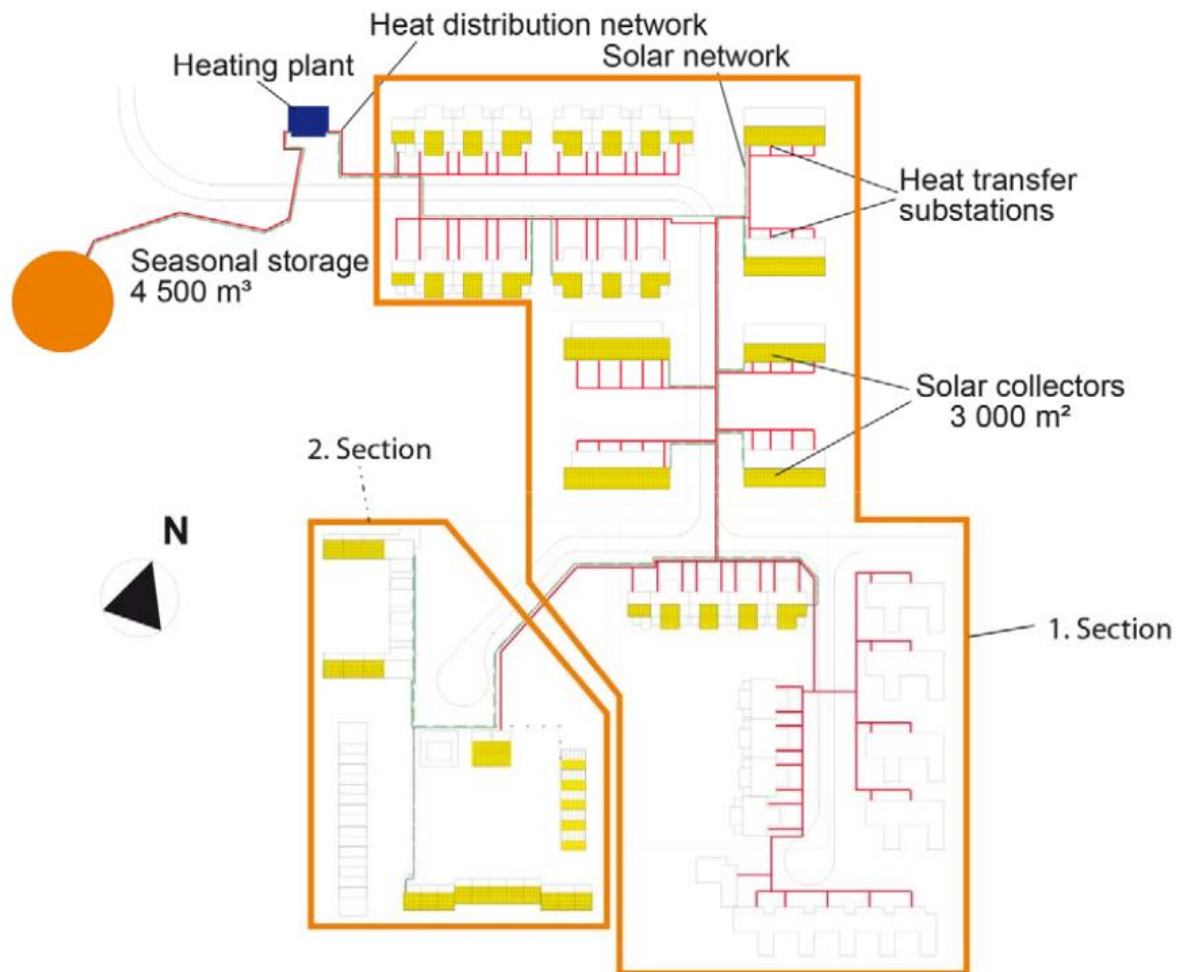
Site plan of the solar thermal generation and thermal storage plant in Hamburg-Bramfeld
